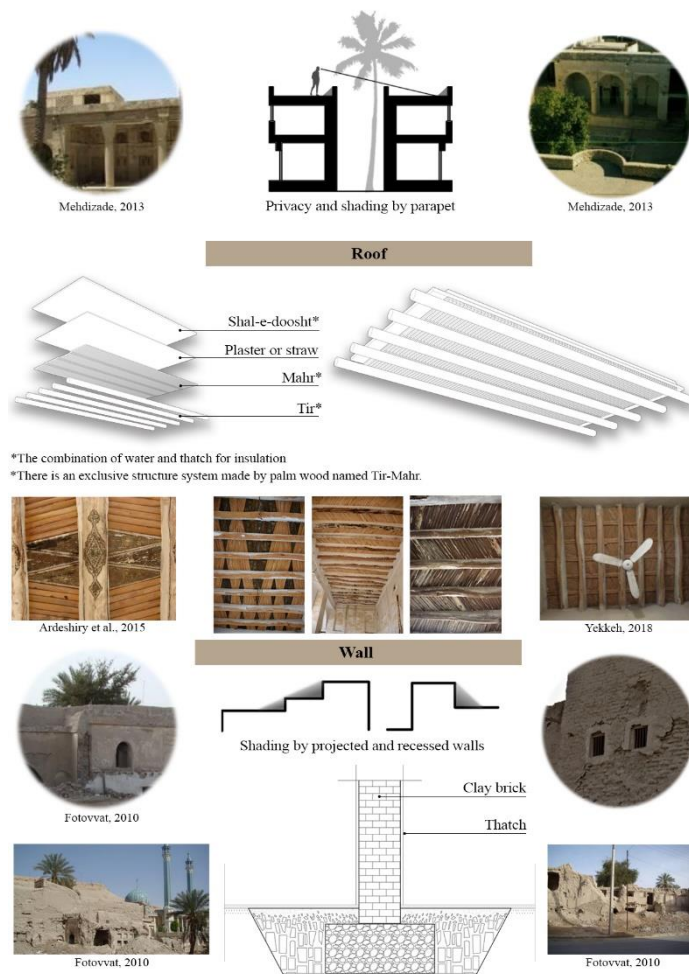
Data Sheet of the Construction Techniques and Materials of the Roof and Wall
